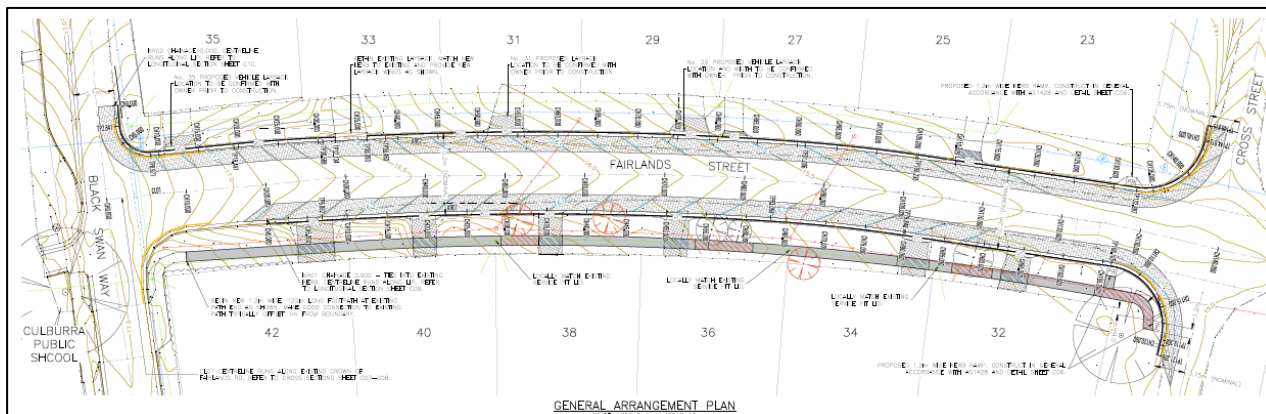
General arrangement plan for kerb and gutter/footpath – Fairlands St, Black Swan Way to Cross St Culburra Beach.
